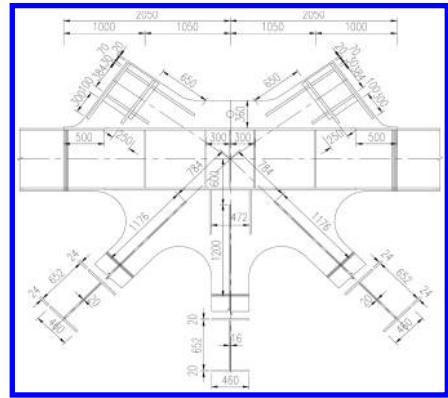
Scheme I: Structure of central buckles cable-girder anchorage joint plate (unit: mm).
